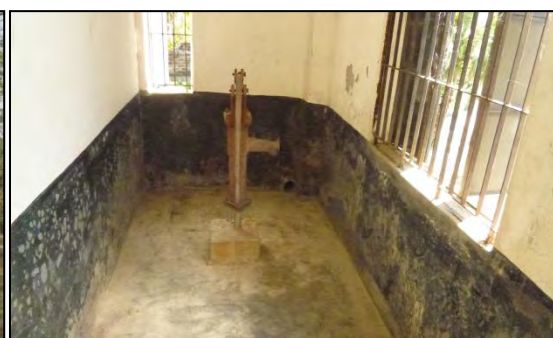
MPCS in Lalua Union Constructed by LGED with provision of Water Facilities
